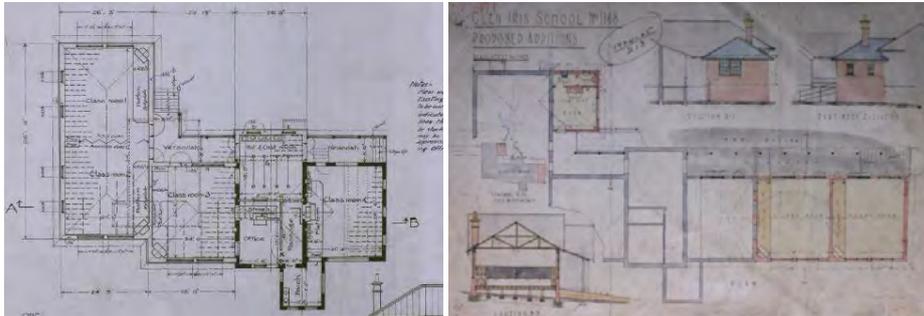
The initial plan prepared for the 1924 addition on the south side (left) and the amended plan with extra rooms (right). The area shaded light yellow on the floor plan on the right-hand side shows the further additional rooms to the north side. (Source: PROV VPRS 3686/P7/482 & VPRS 3686/P7/482)
